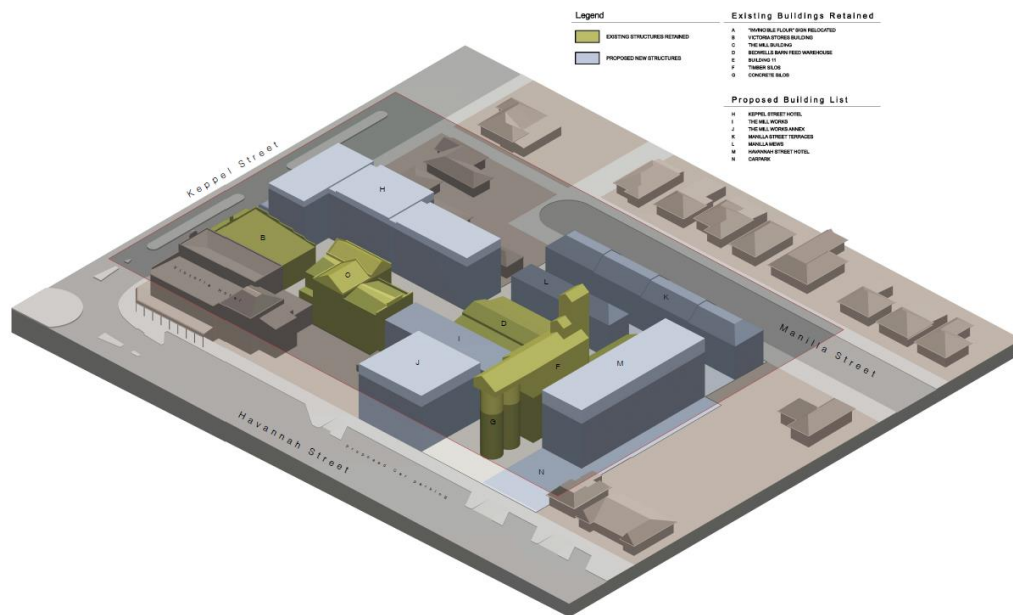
Proposed Height Plane Analysis showing all retained buildings in yellow (Source: Karl Walls Design)
